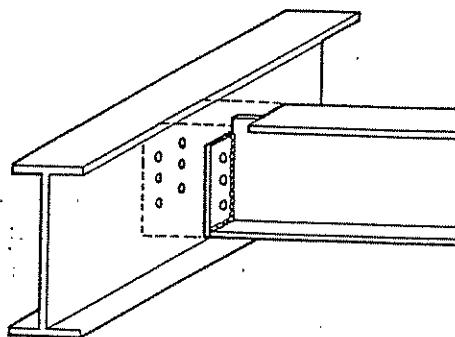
Schematic arrangement for a beam-to-beam connection using a welded end plate.
